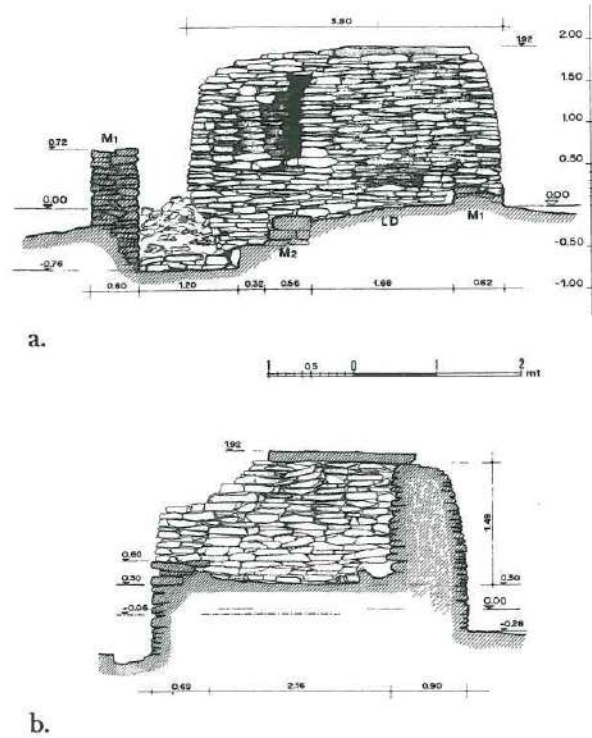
Tomb MNQ/T1: a) section A-A; b) section B-B (see plan on Fig. 25).
